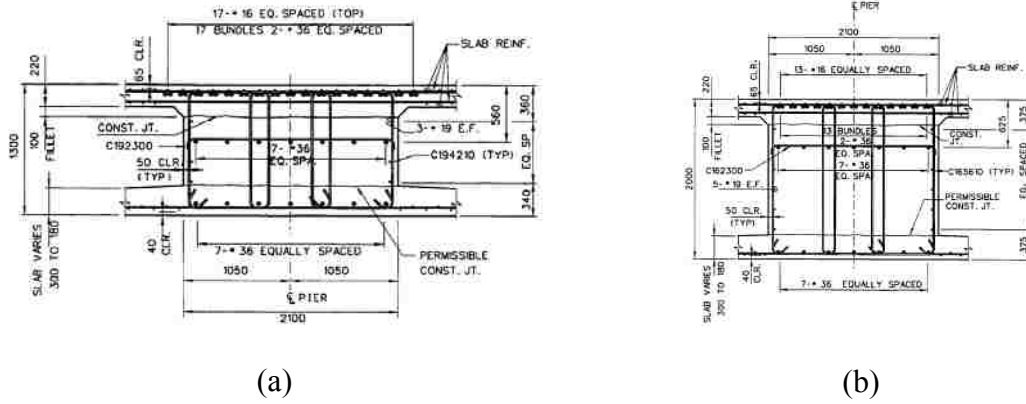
Bridge I-2139 - Bridge cap beam sections at (a) pier 1 and (b) pier 2
